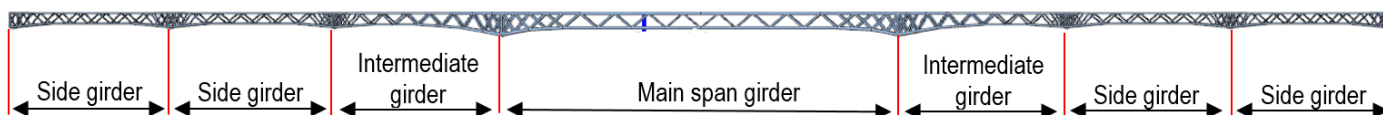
DISTRIBUTION OF MAIN GIRDER, INTERMEDIATE GIRDERS AND SIDE GIRDERS IN SCIA MODEL #2
